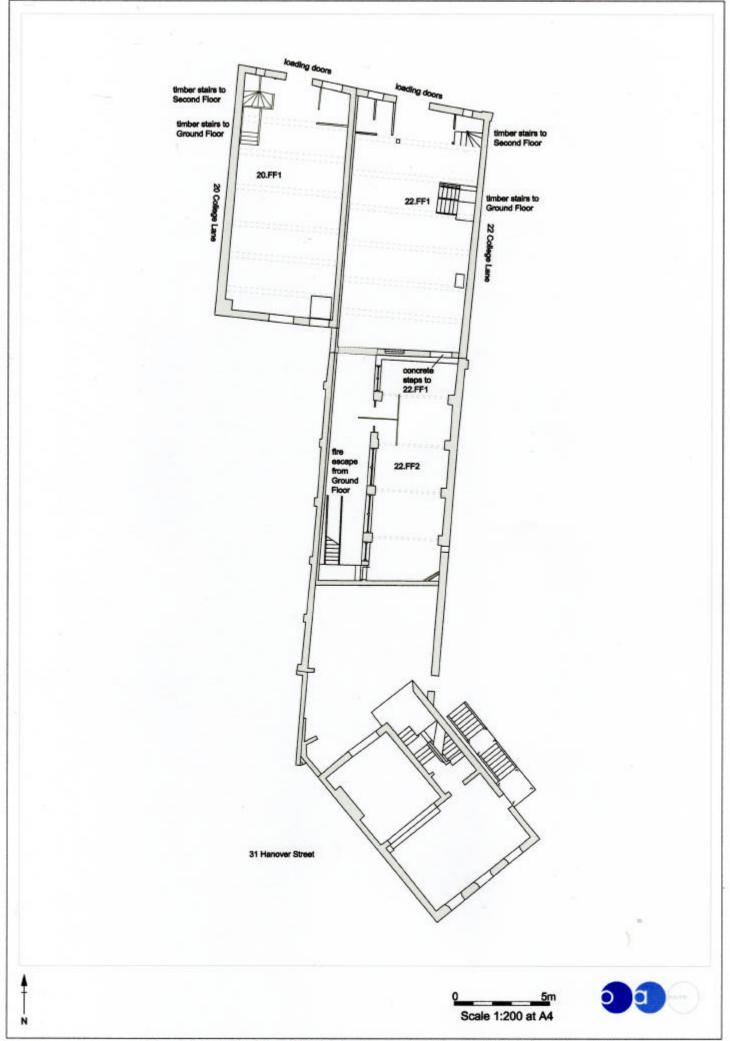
Detailed Plan of 20 College Lane, First Floor, and 22 College Lane, First Floor
